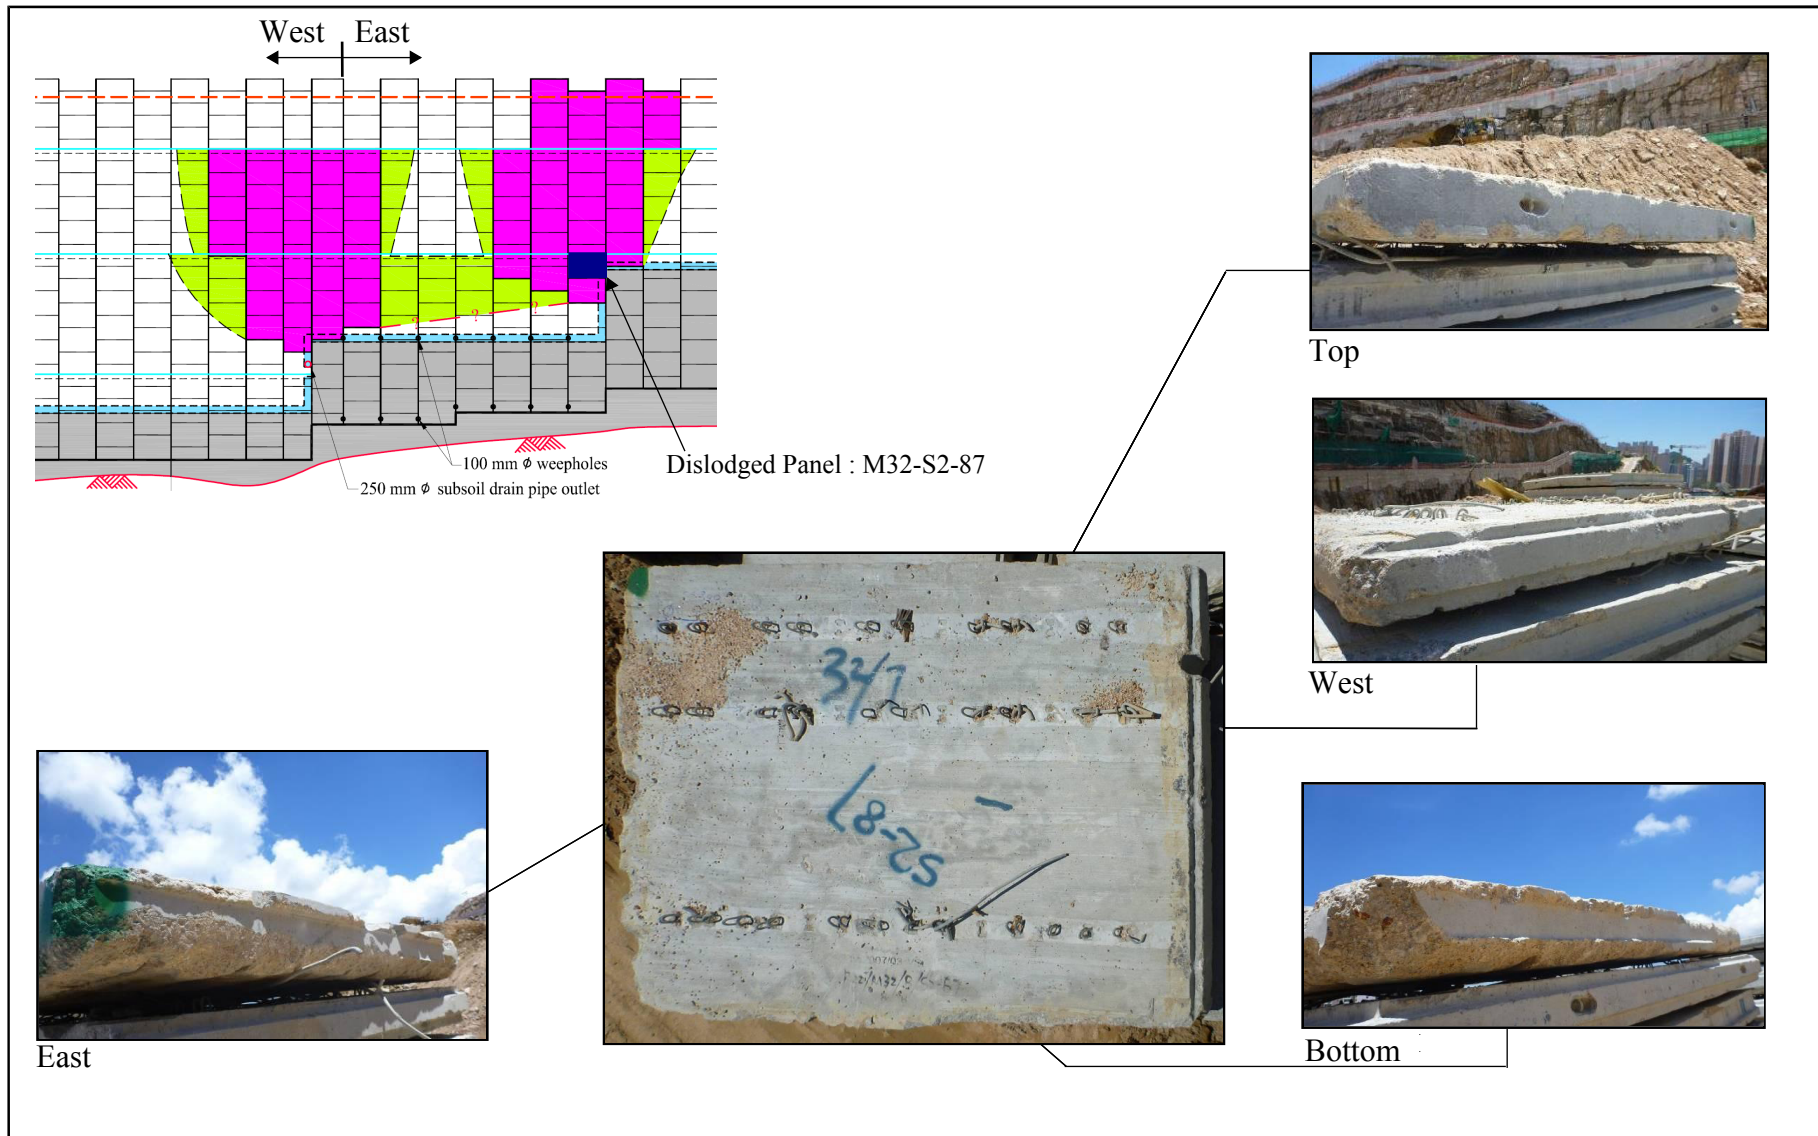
Condition of Key Dislodged Panel at Bays 6/7 of Wall R22
